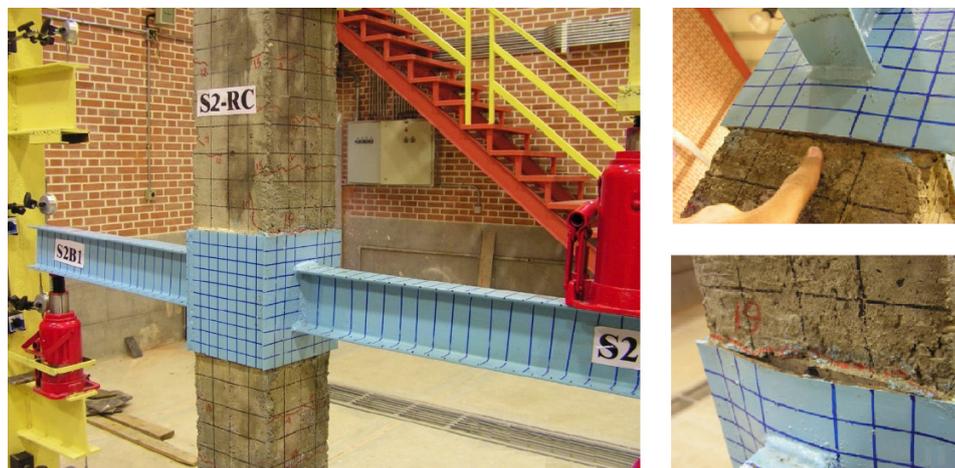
Damage pattern in specimen S2 at 5.0% beam drift
